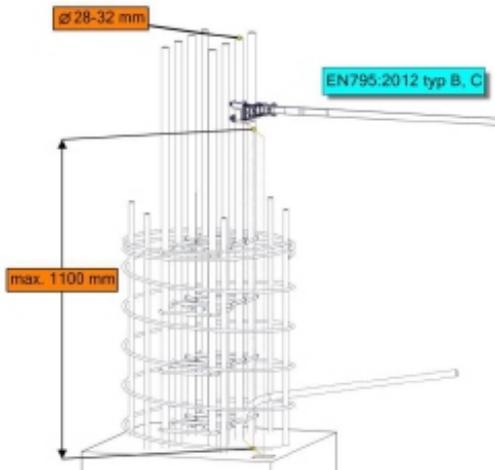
Installation of horizontal lifelines in connection with anchor point A-165
